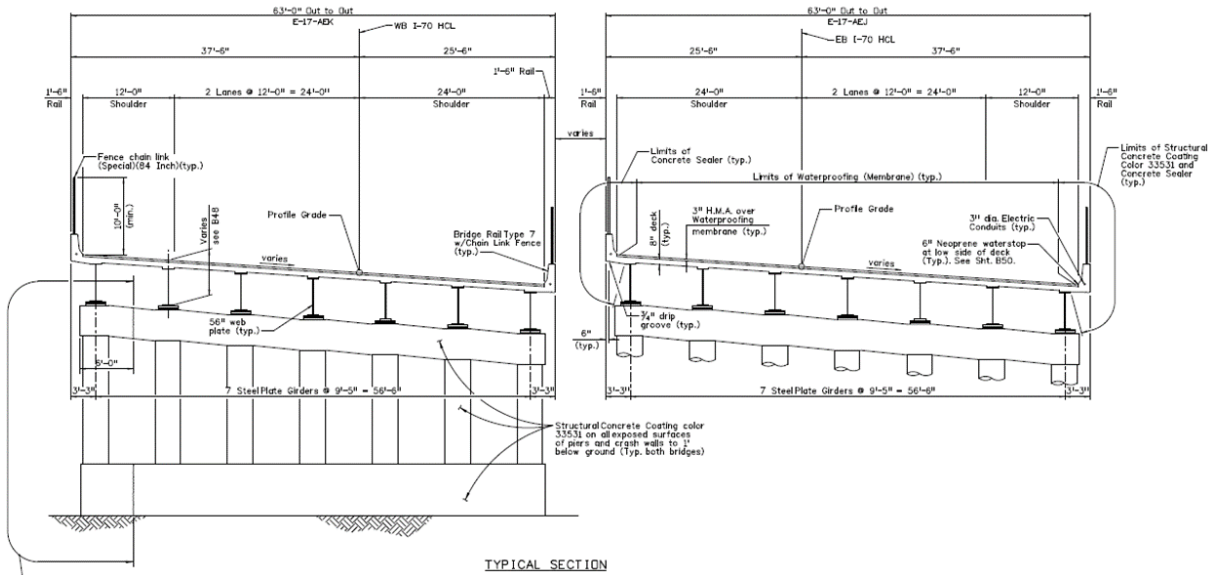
Diagram. Typical section for bridges E-17-AEJ and E-17-AEK.
